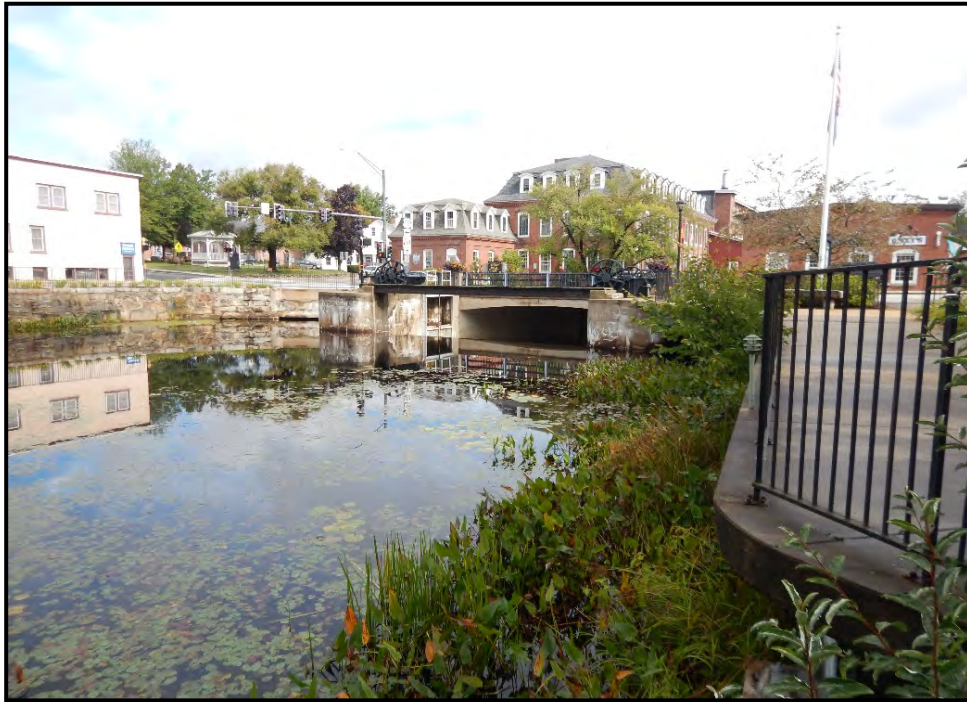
View north toward the Main Street Dam. Contoocook River flows south to north under Main Street/NH 202. Jaffrey Mills in center of photo. 09/07/2017.
